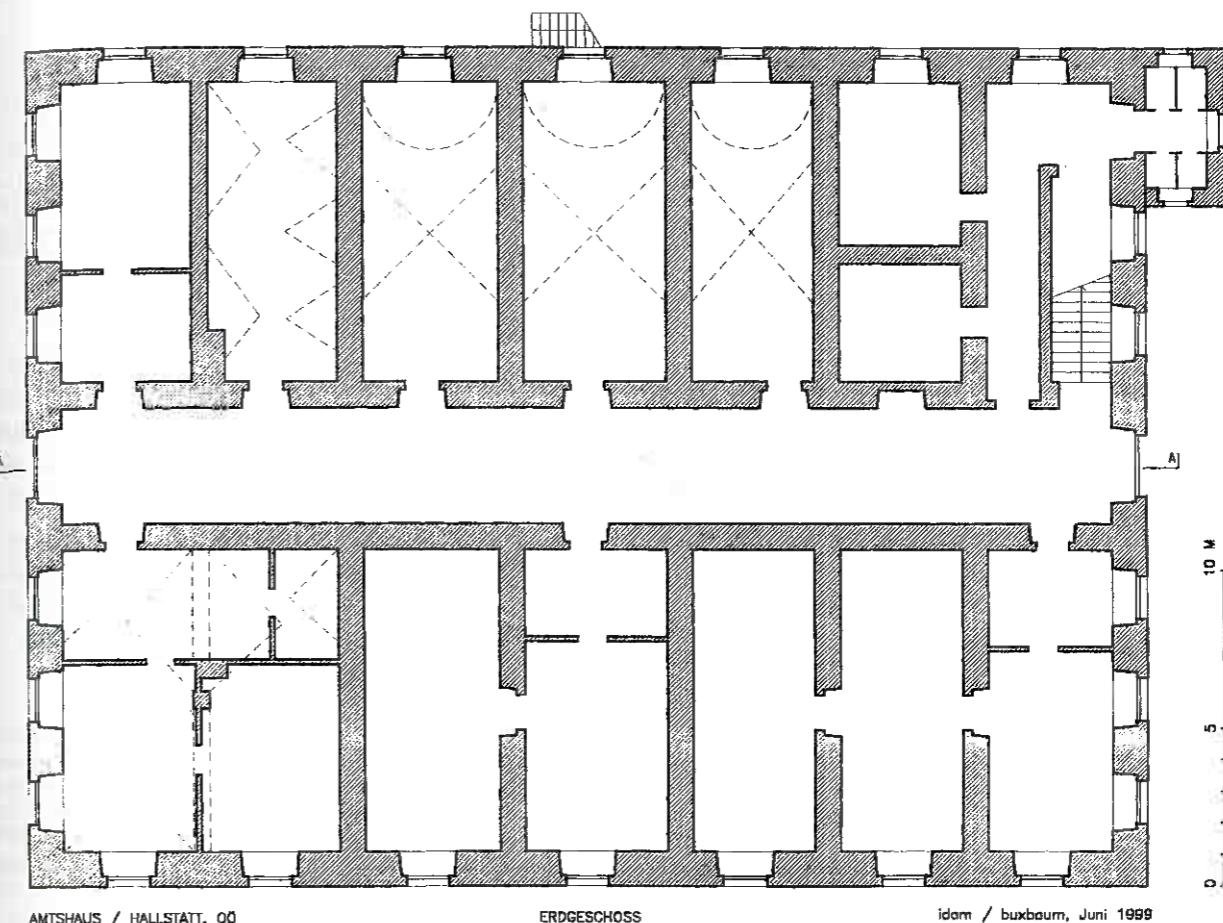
Amtshaus, Ground Floor (Idam/Buxbaum)
